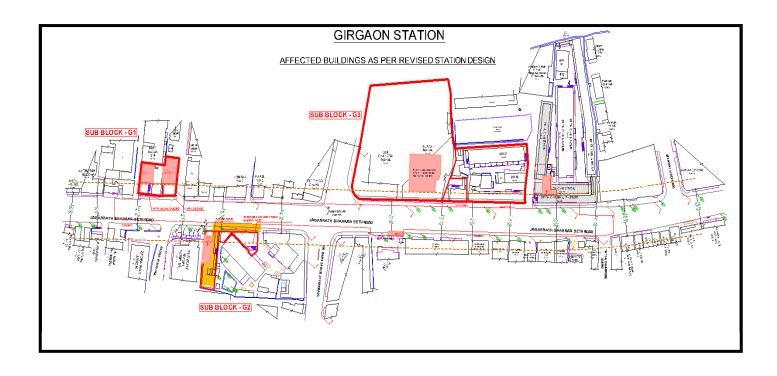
RESETTLEMENT SITE AT G3 Building (Girgaon heights).
